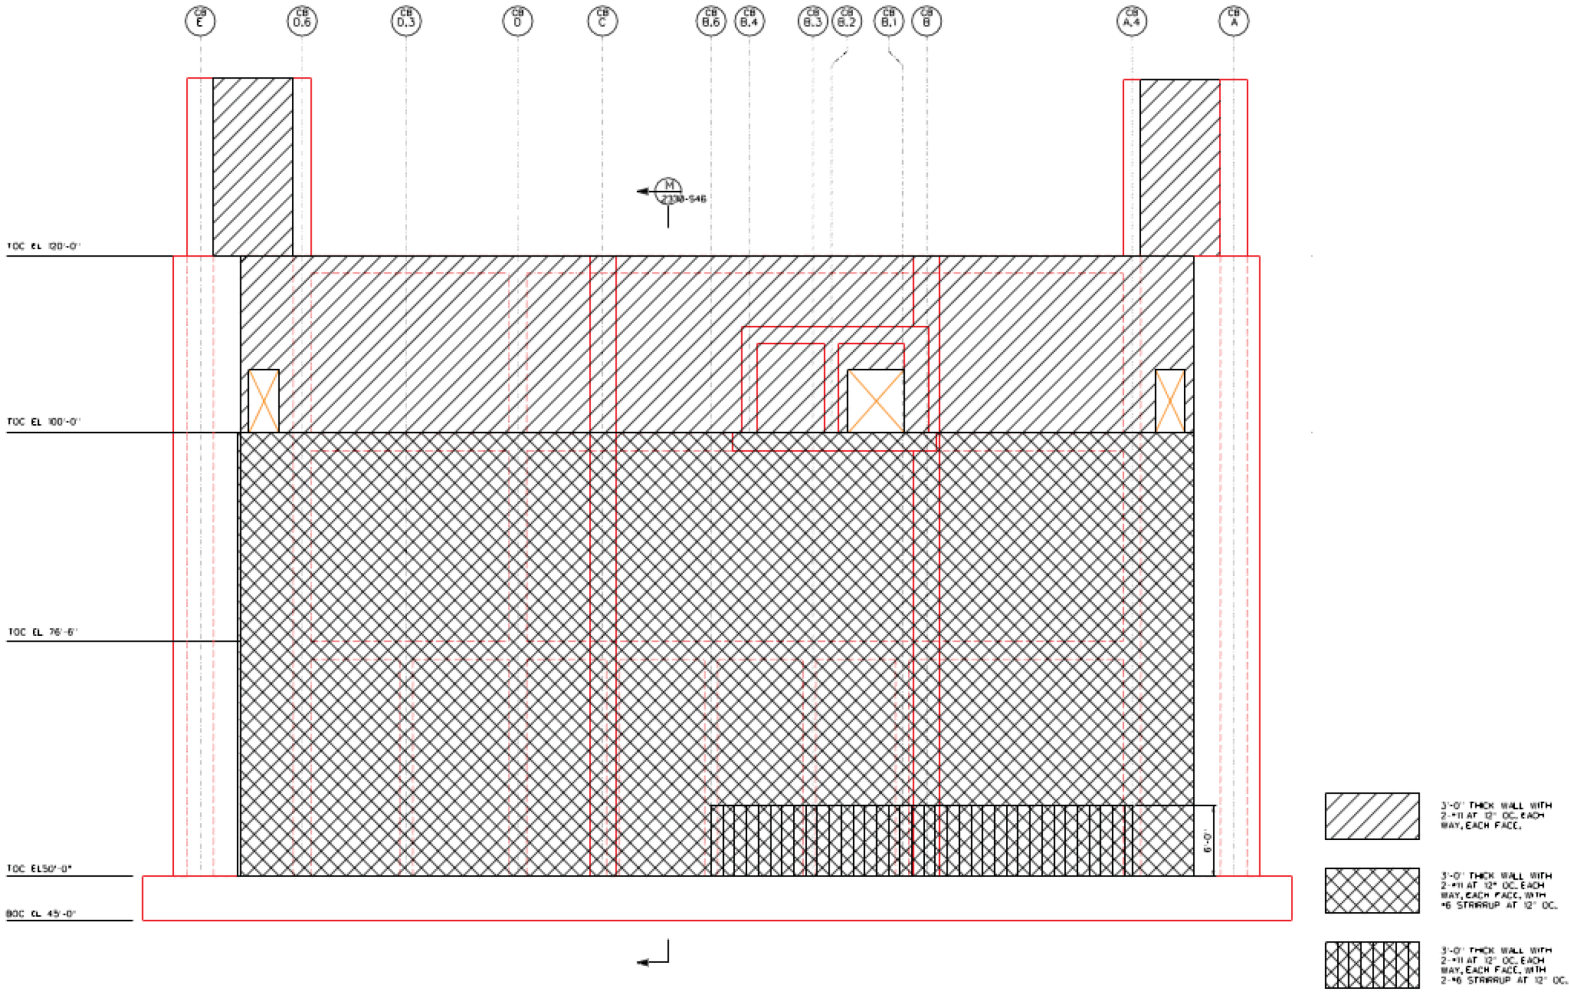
B-70: CRB Reinforcement Section View of Wall on Grid Line 4
